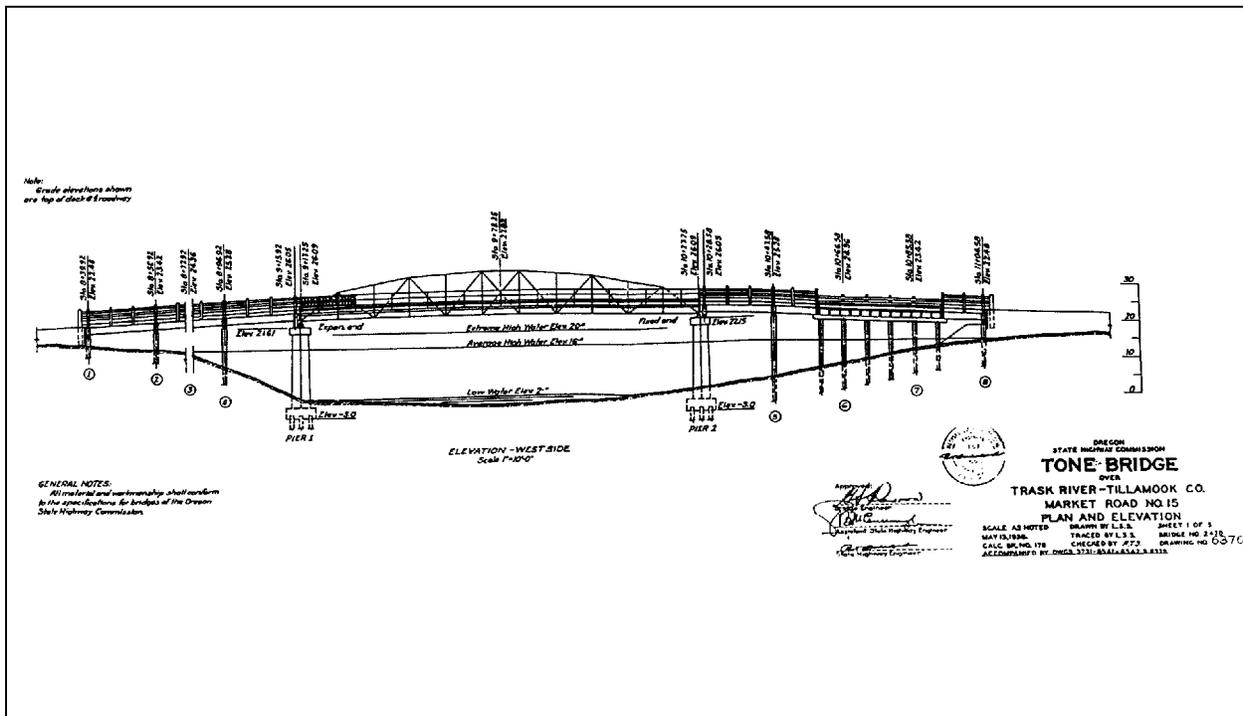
Example of Original Bridge Design Drawing Showing River Channel Geometry
